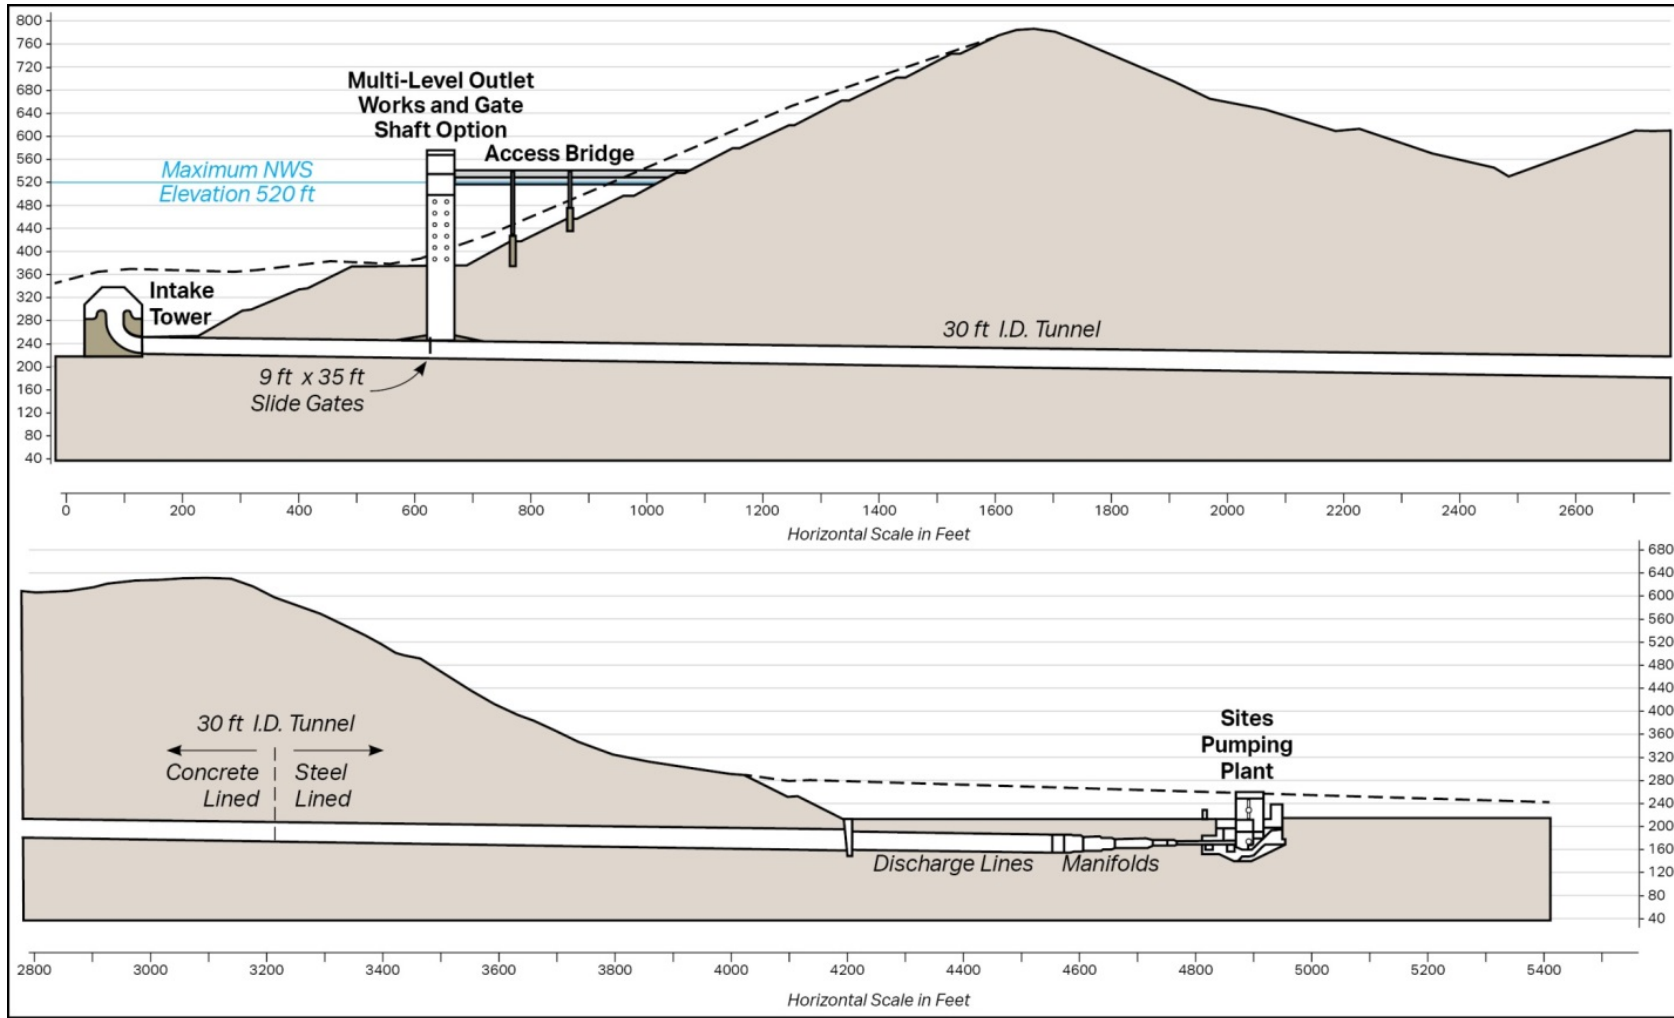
Inlet/Outlet – Profile – 1.8 MAF Reservoir
